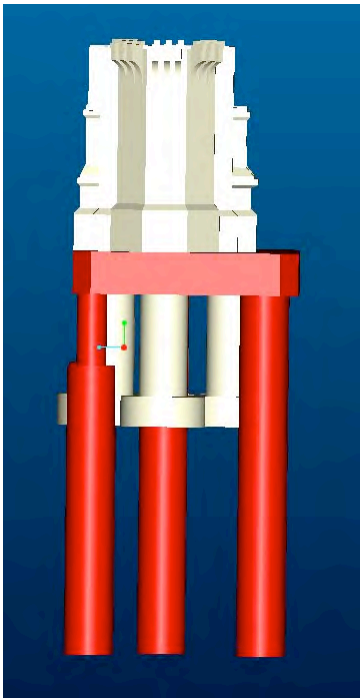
Computer Rendering Showing Side View of the Pier with New Drilled Shafts and Footing
